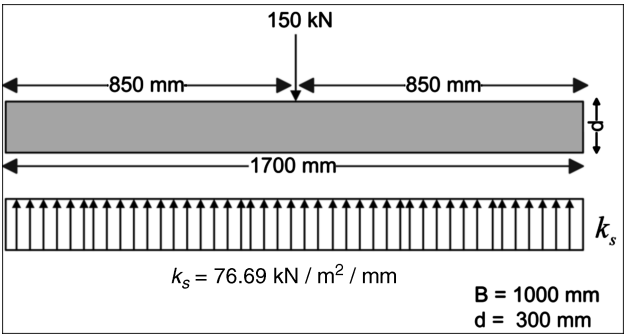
C.8 Details of loading and modulus of the subgrade reaction of a beam resting on an elastic foundation (Example 12.3).
